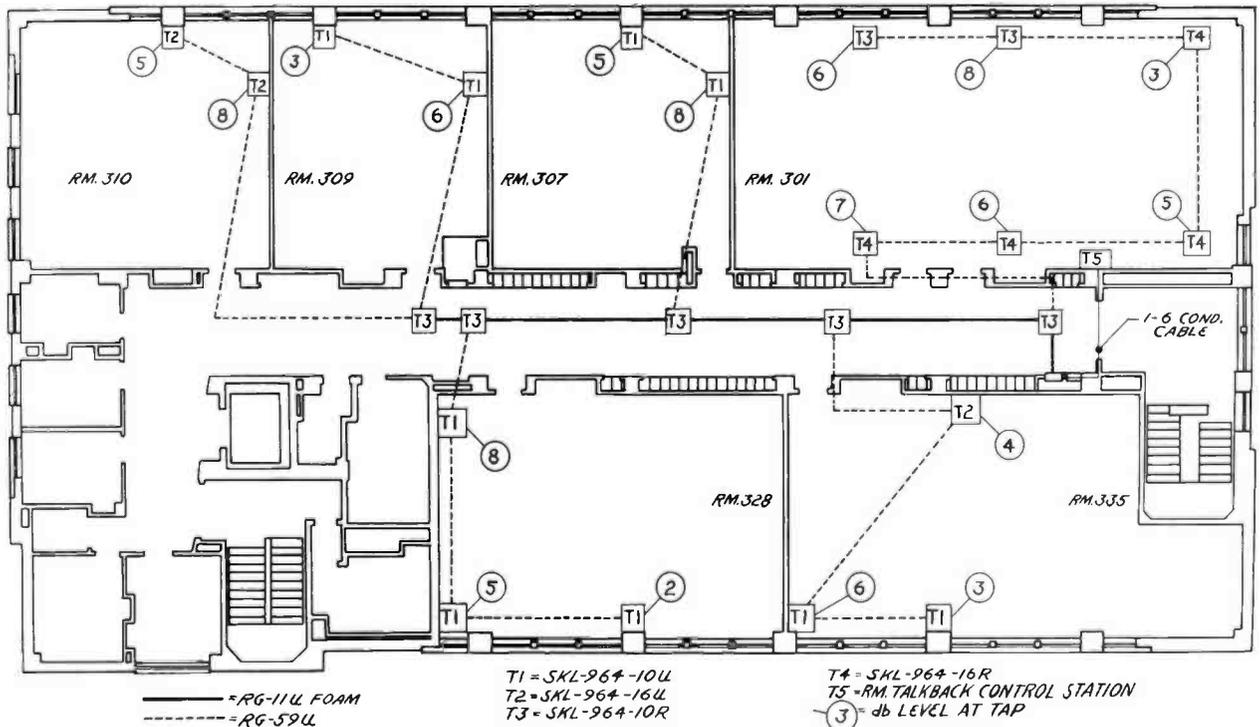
Third floor plan of University of Akron's College of Education Building showing cable distribution.
